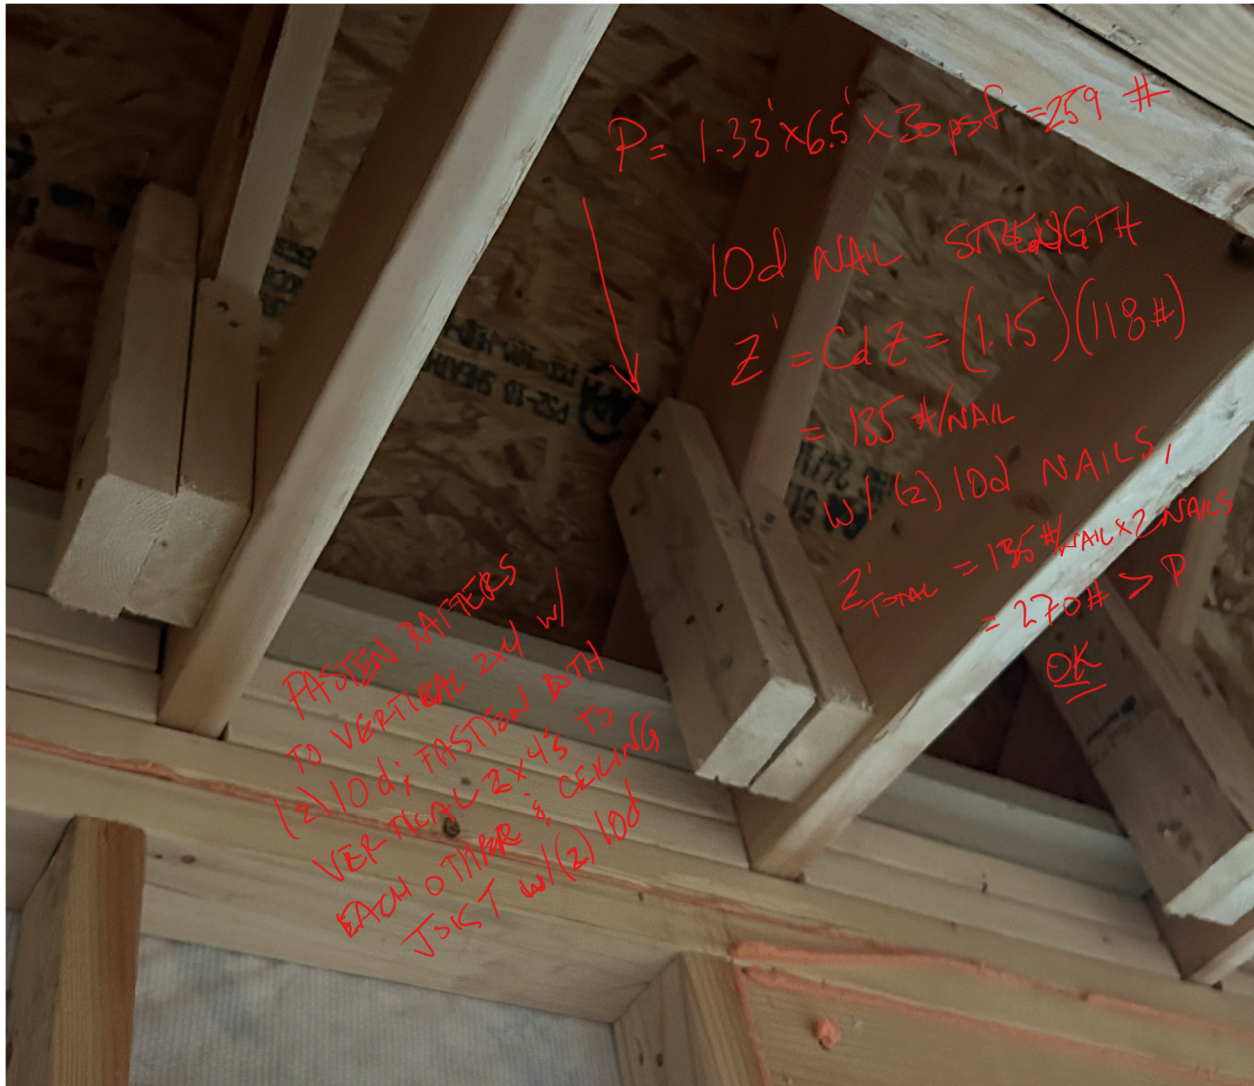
fastening of rafters to vertical 2x4's and vertical 2x4's to ceiling joists
